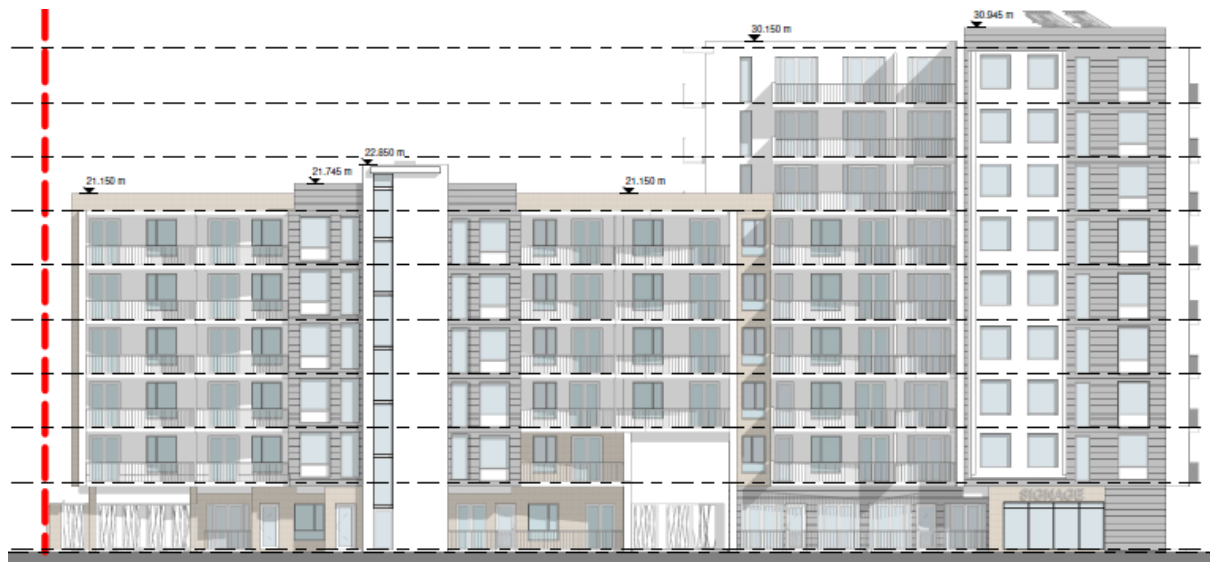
Northern elevation (fronting onto Second Avenue) of proposed amended development
